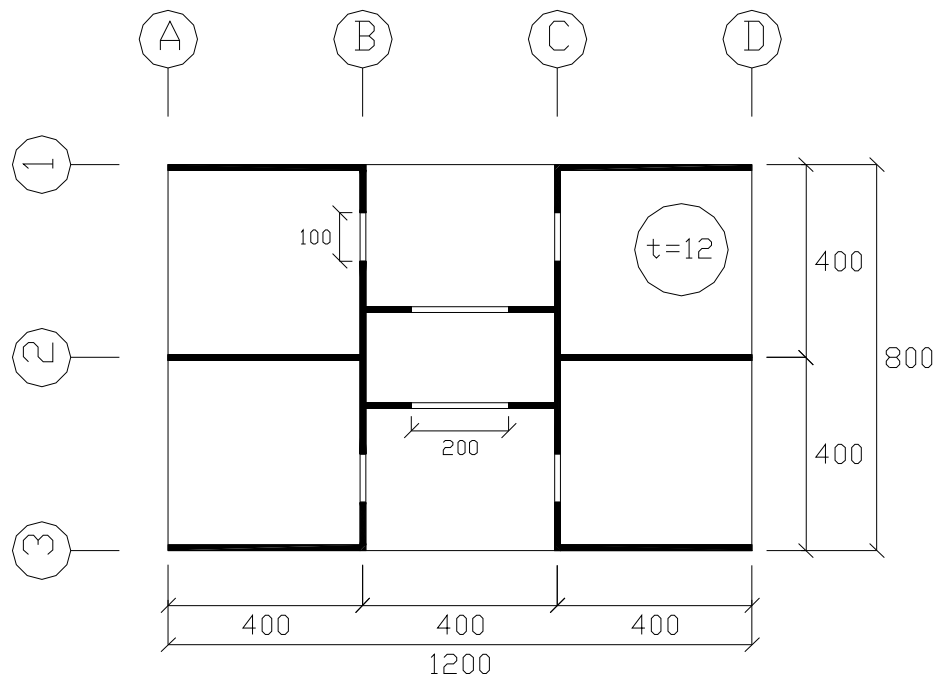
Typical plan view – Plan No. 5 (units in cm)
